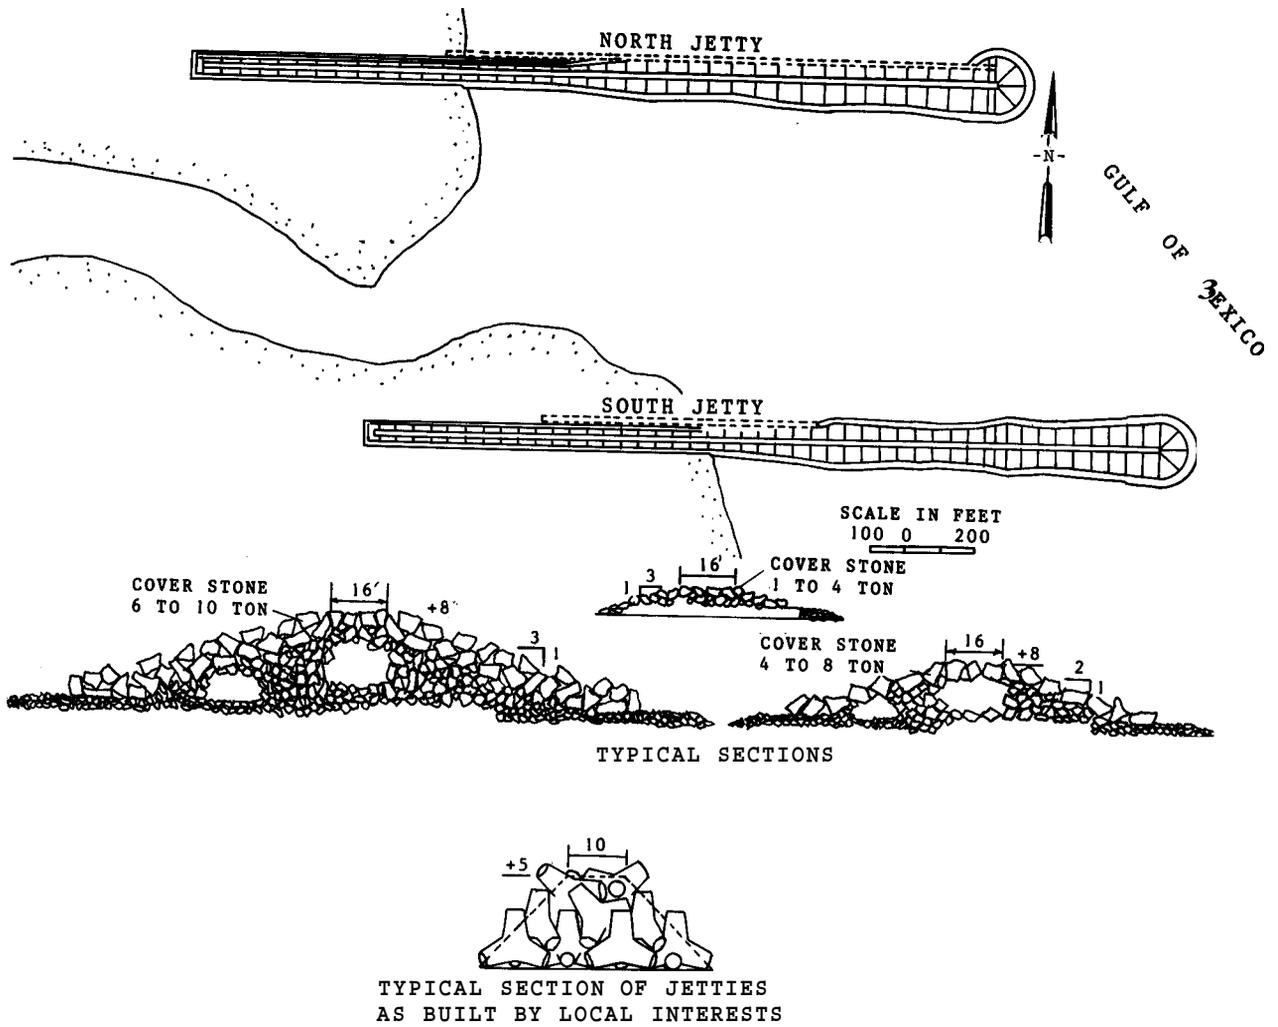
Plan view and typical cross sections of Port Mansfield jetties
